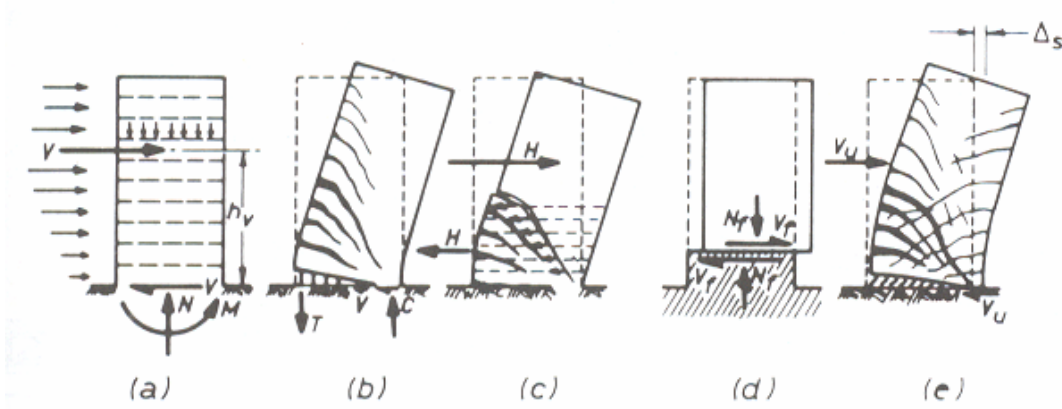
Common failure modes exhibited in structural walls (Paulay and Priestley, 1992)
